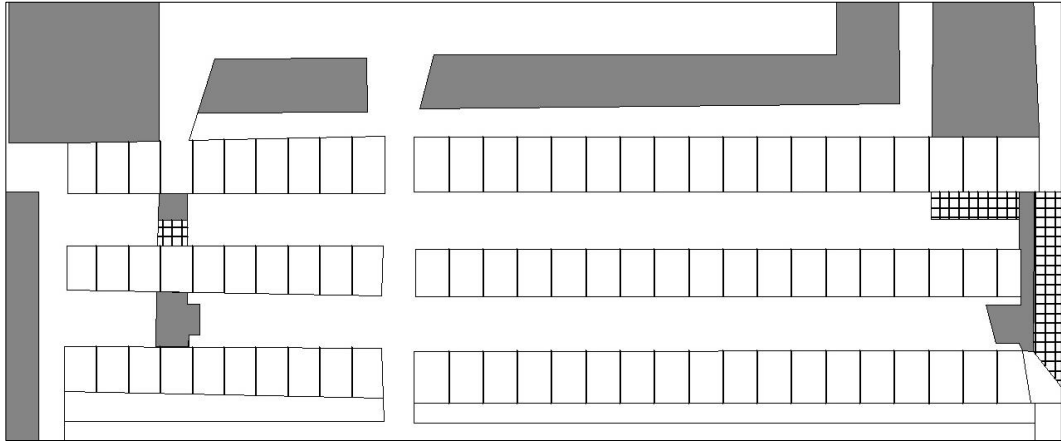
Palais Royal, Galeries de Bois, plan.
